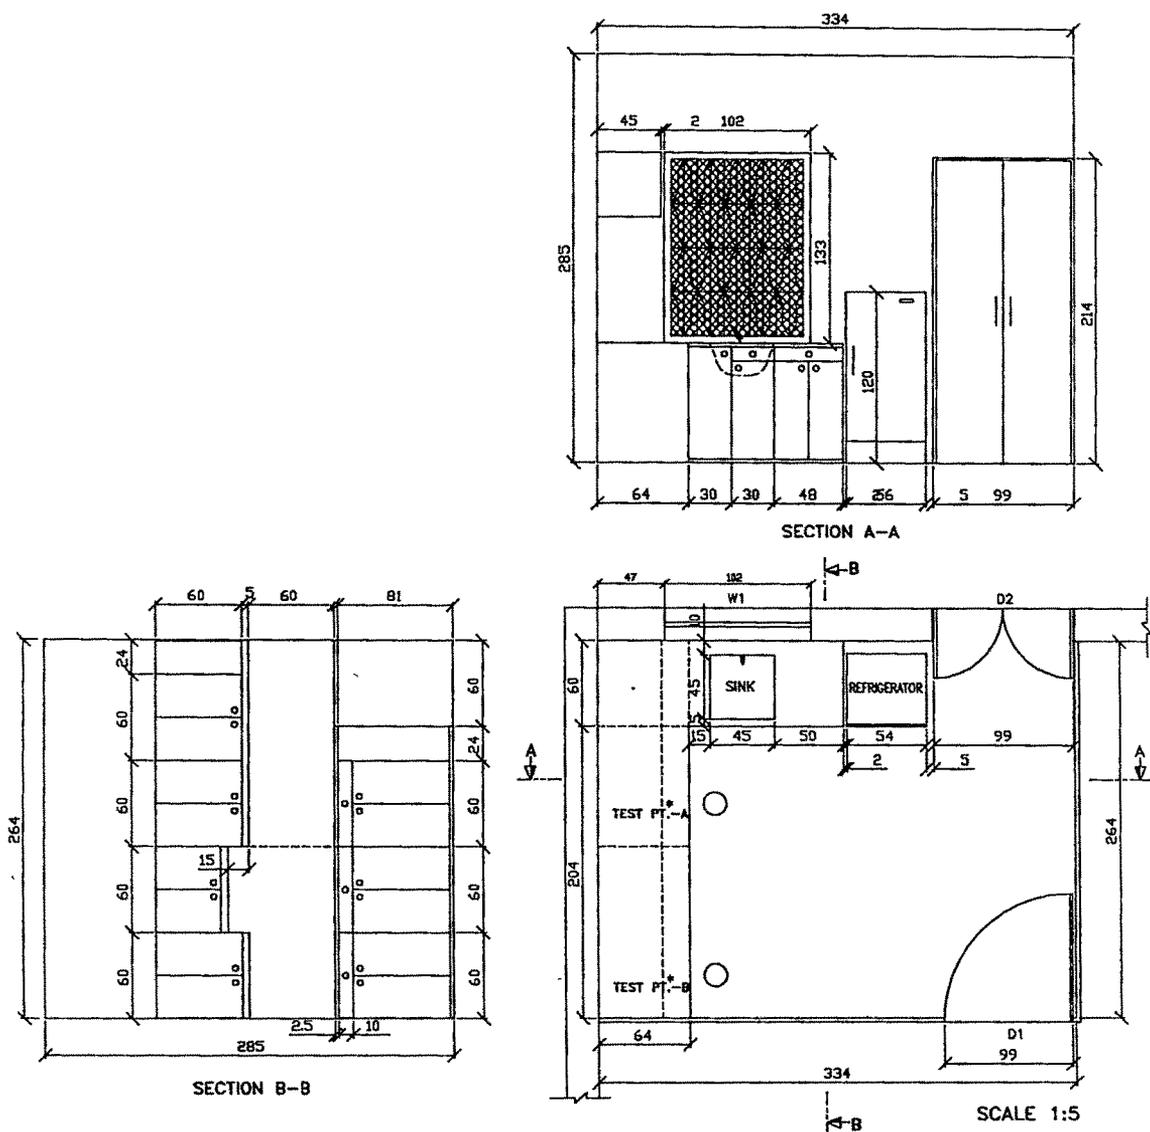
FLOOR PLAN AND ELEVATIONS OF THE SIMULATED KITCHEN WITH THE TEST POINTS (DIMENSIONS IN cm.)
